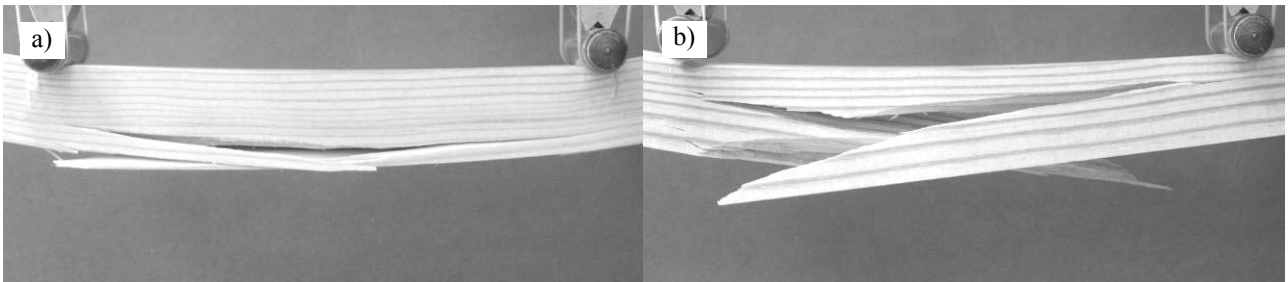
Two examples of cross-grain tension failures for an undamaged beam.
